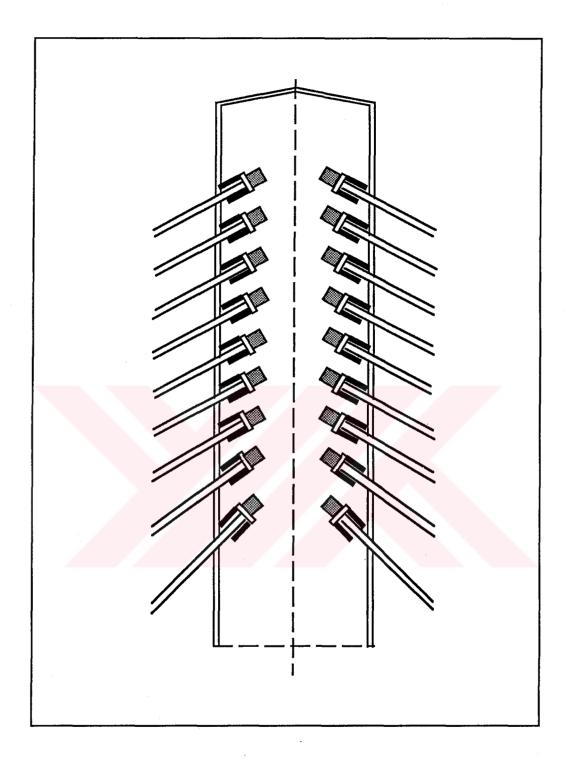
ARRANGEMENT OF CABLE ANCHORS IN A MODIFIED MULTI-CABLE FAN SYSTEM
